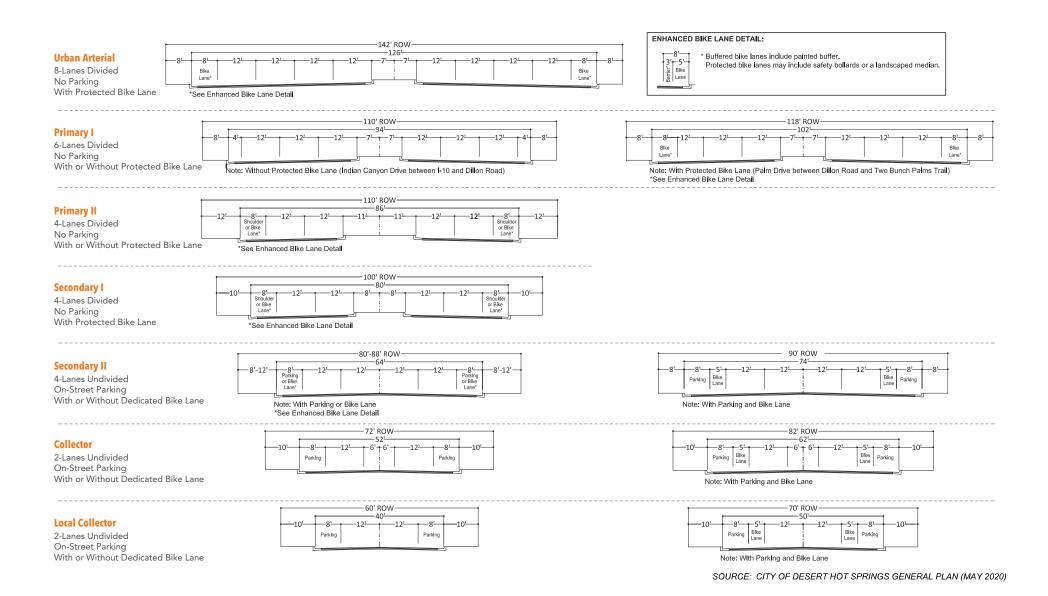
CITY OF DESERT HOT SPRINGS GENERAL PLAN ROADWAY CROSS-SECTIONS
